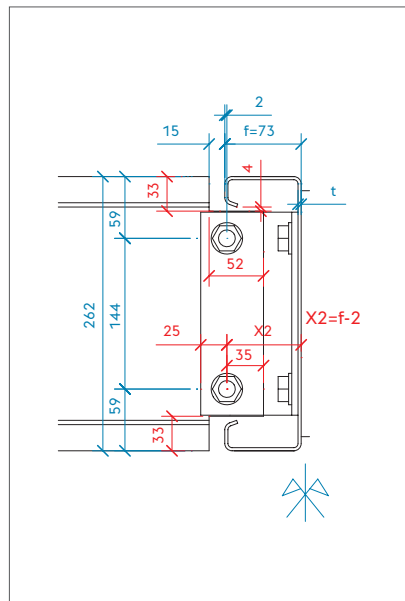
Example of a connection of a floor beam made of 262C+15 to a girder made of 262C+25
